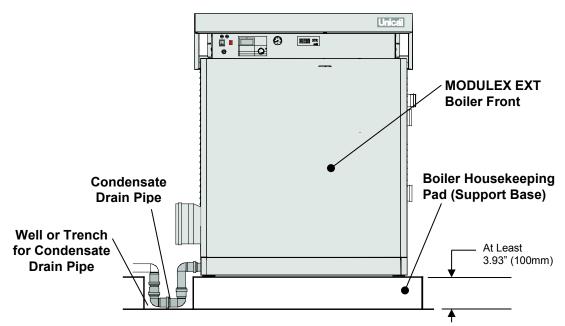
Boiler (Front View) on Housekeeping Pad with Condensate Drain Pipe
